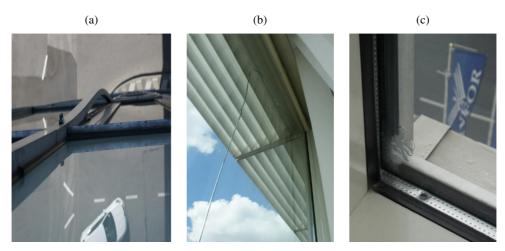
Errors resulting from improper maintenance: (a) permanently deformed metal elements of the façade structure, (b) glass breakage, (c) sealant failure with local delamination (photos by M. Cwyl)
